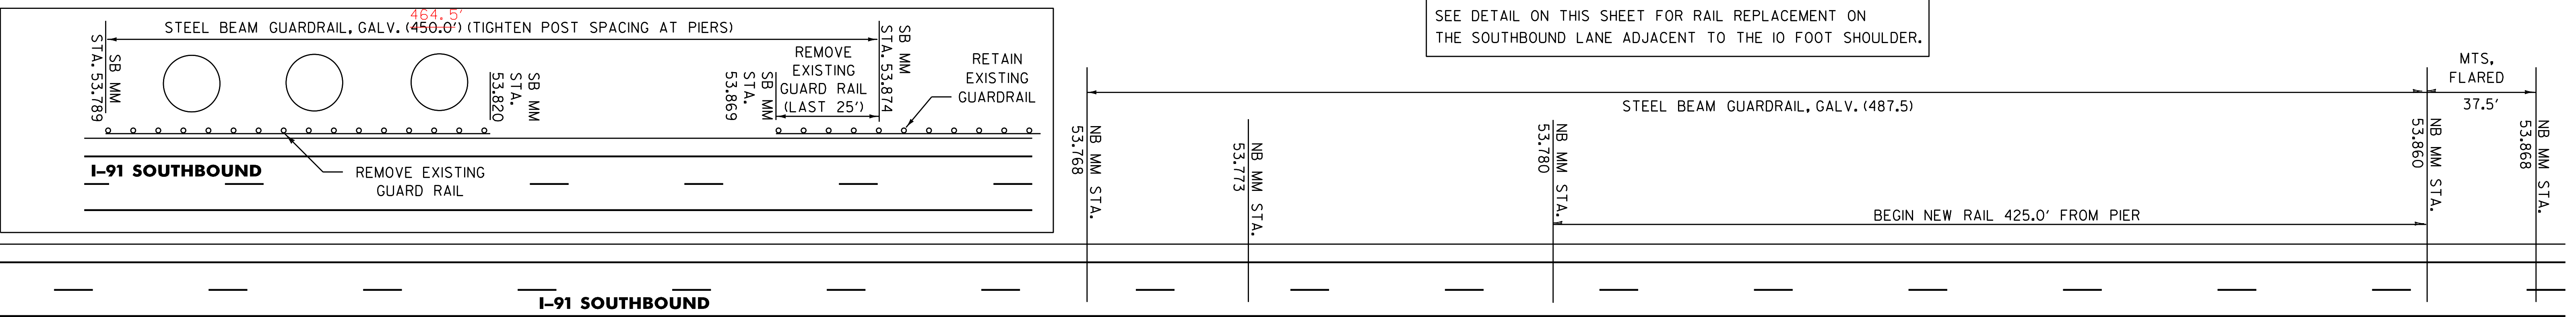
DETAIL OF SOUTHBOUND GUARDRAIL TREATMENT AT THE 10 FOOT SHOULDER
